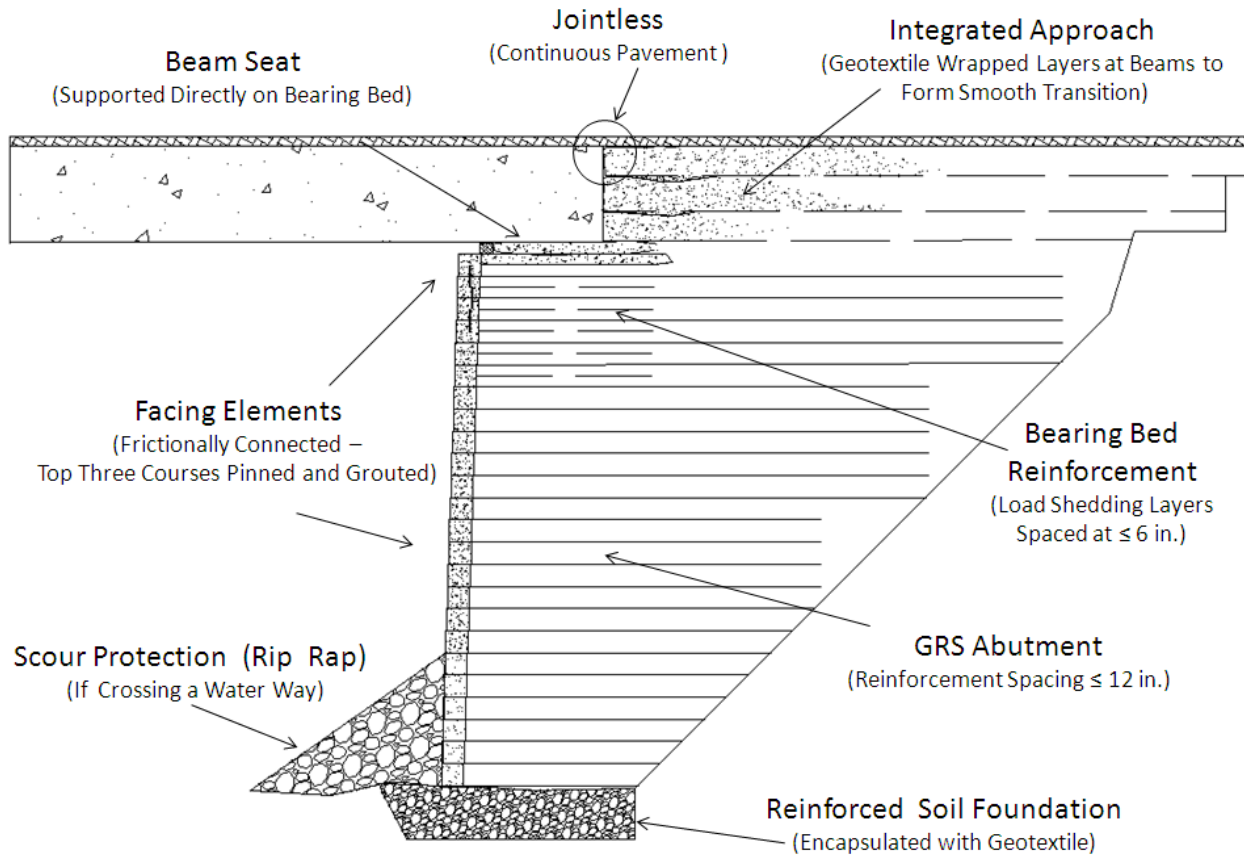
Illustration. Typical cross-section of GRS bridge abutment.⁽²¹⁾
